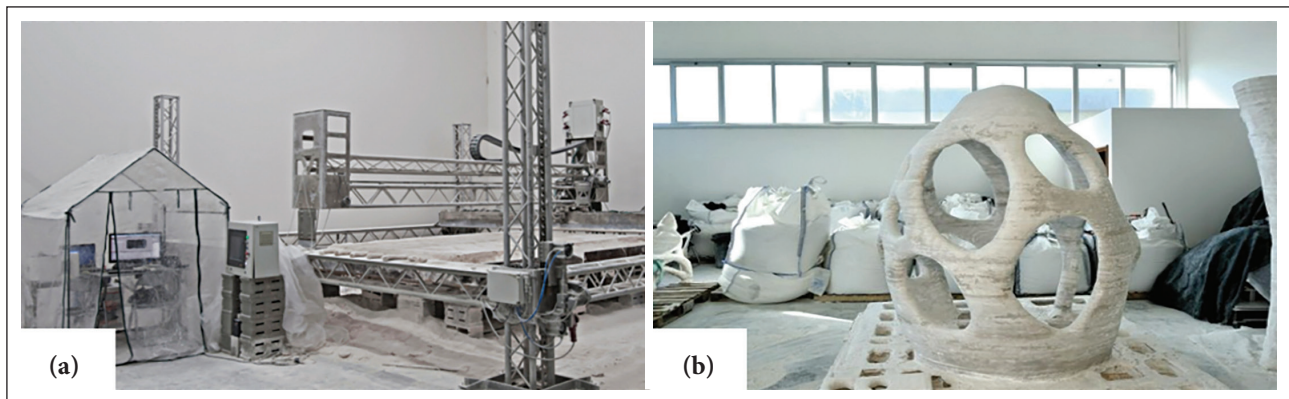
(a) D-shape second generation 3D-Printer (b) final printed structure after removal of extra sand-based materials [41, 51, 52].
